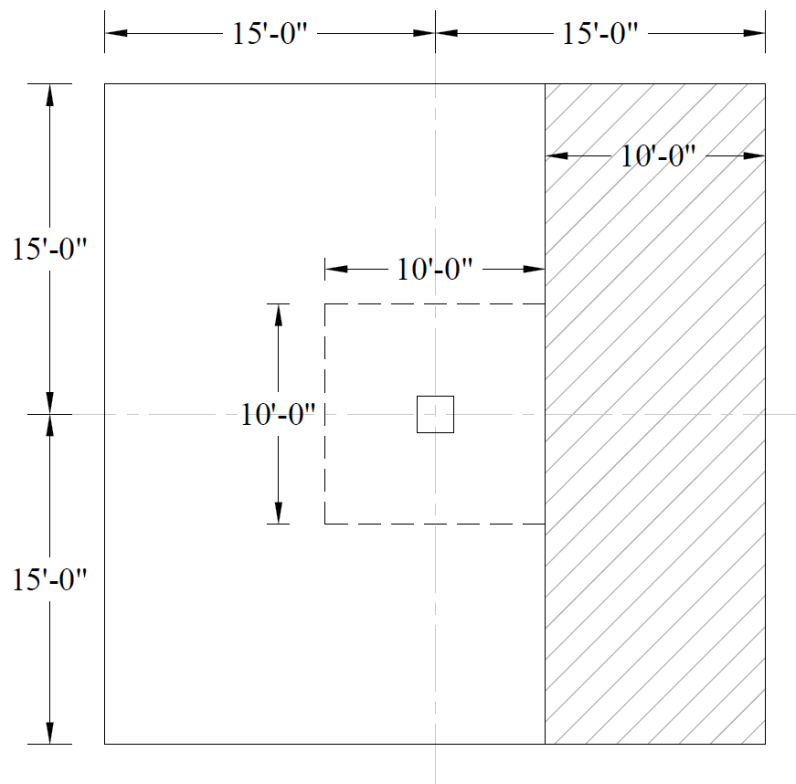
Critical Section at the Face of the Drop Panel for One-Way Shear
